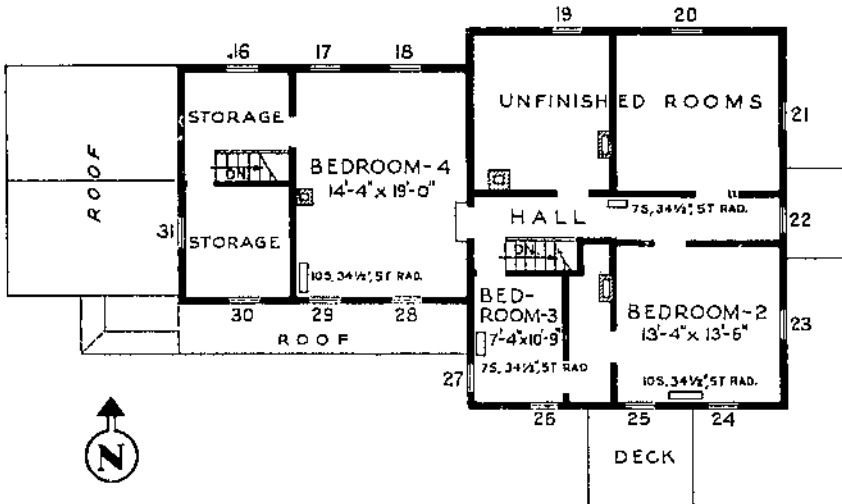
Second-floor plan of house No. 8, showing the location of radiators.
